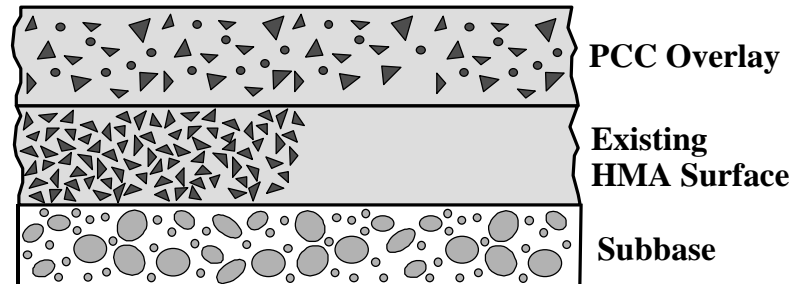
Rigid pavement overlay of flexible pavement (whitetopping).⁽¹⁾
